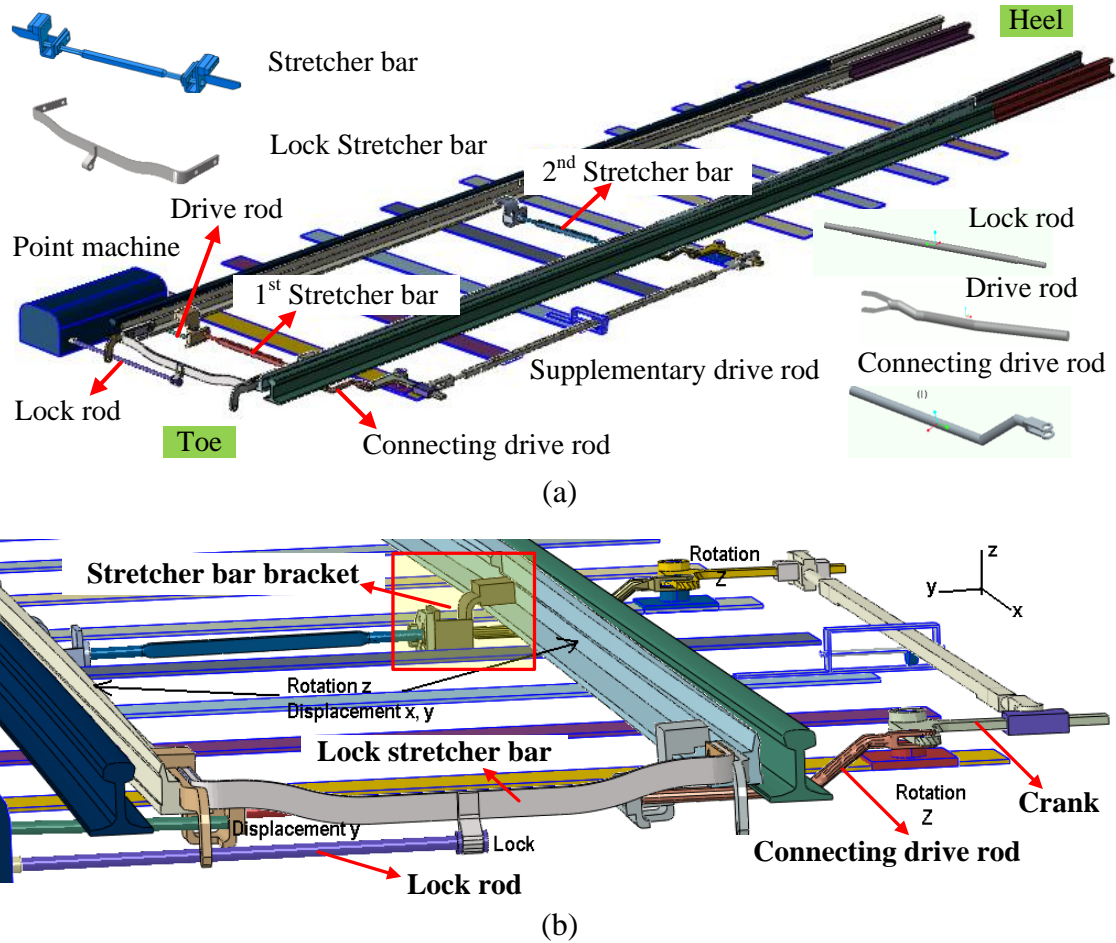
Complete three-dimensional model of the switch and HW electric point mechanism; (a) general view; (b) zoom in view
